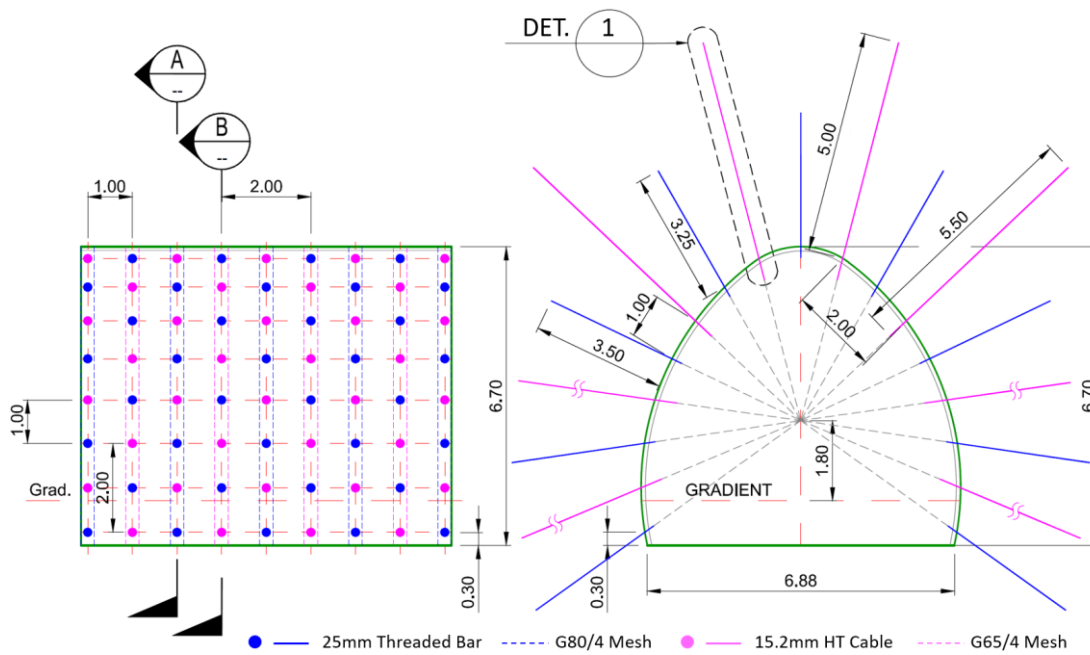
Complete ground support scheme arrangement and Cross-Section A.
